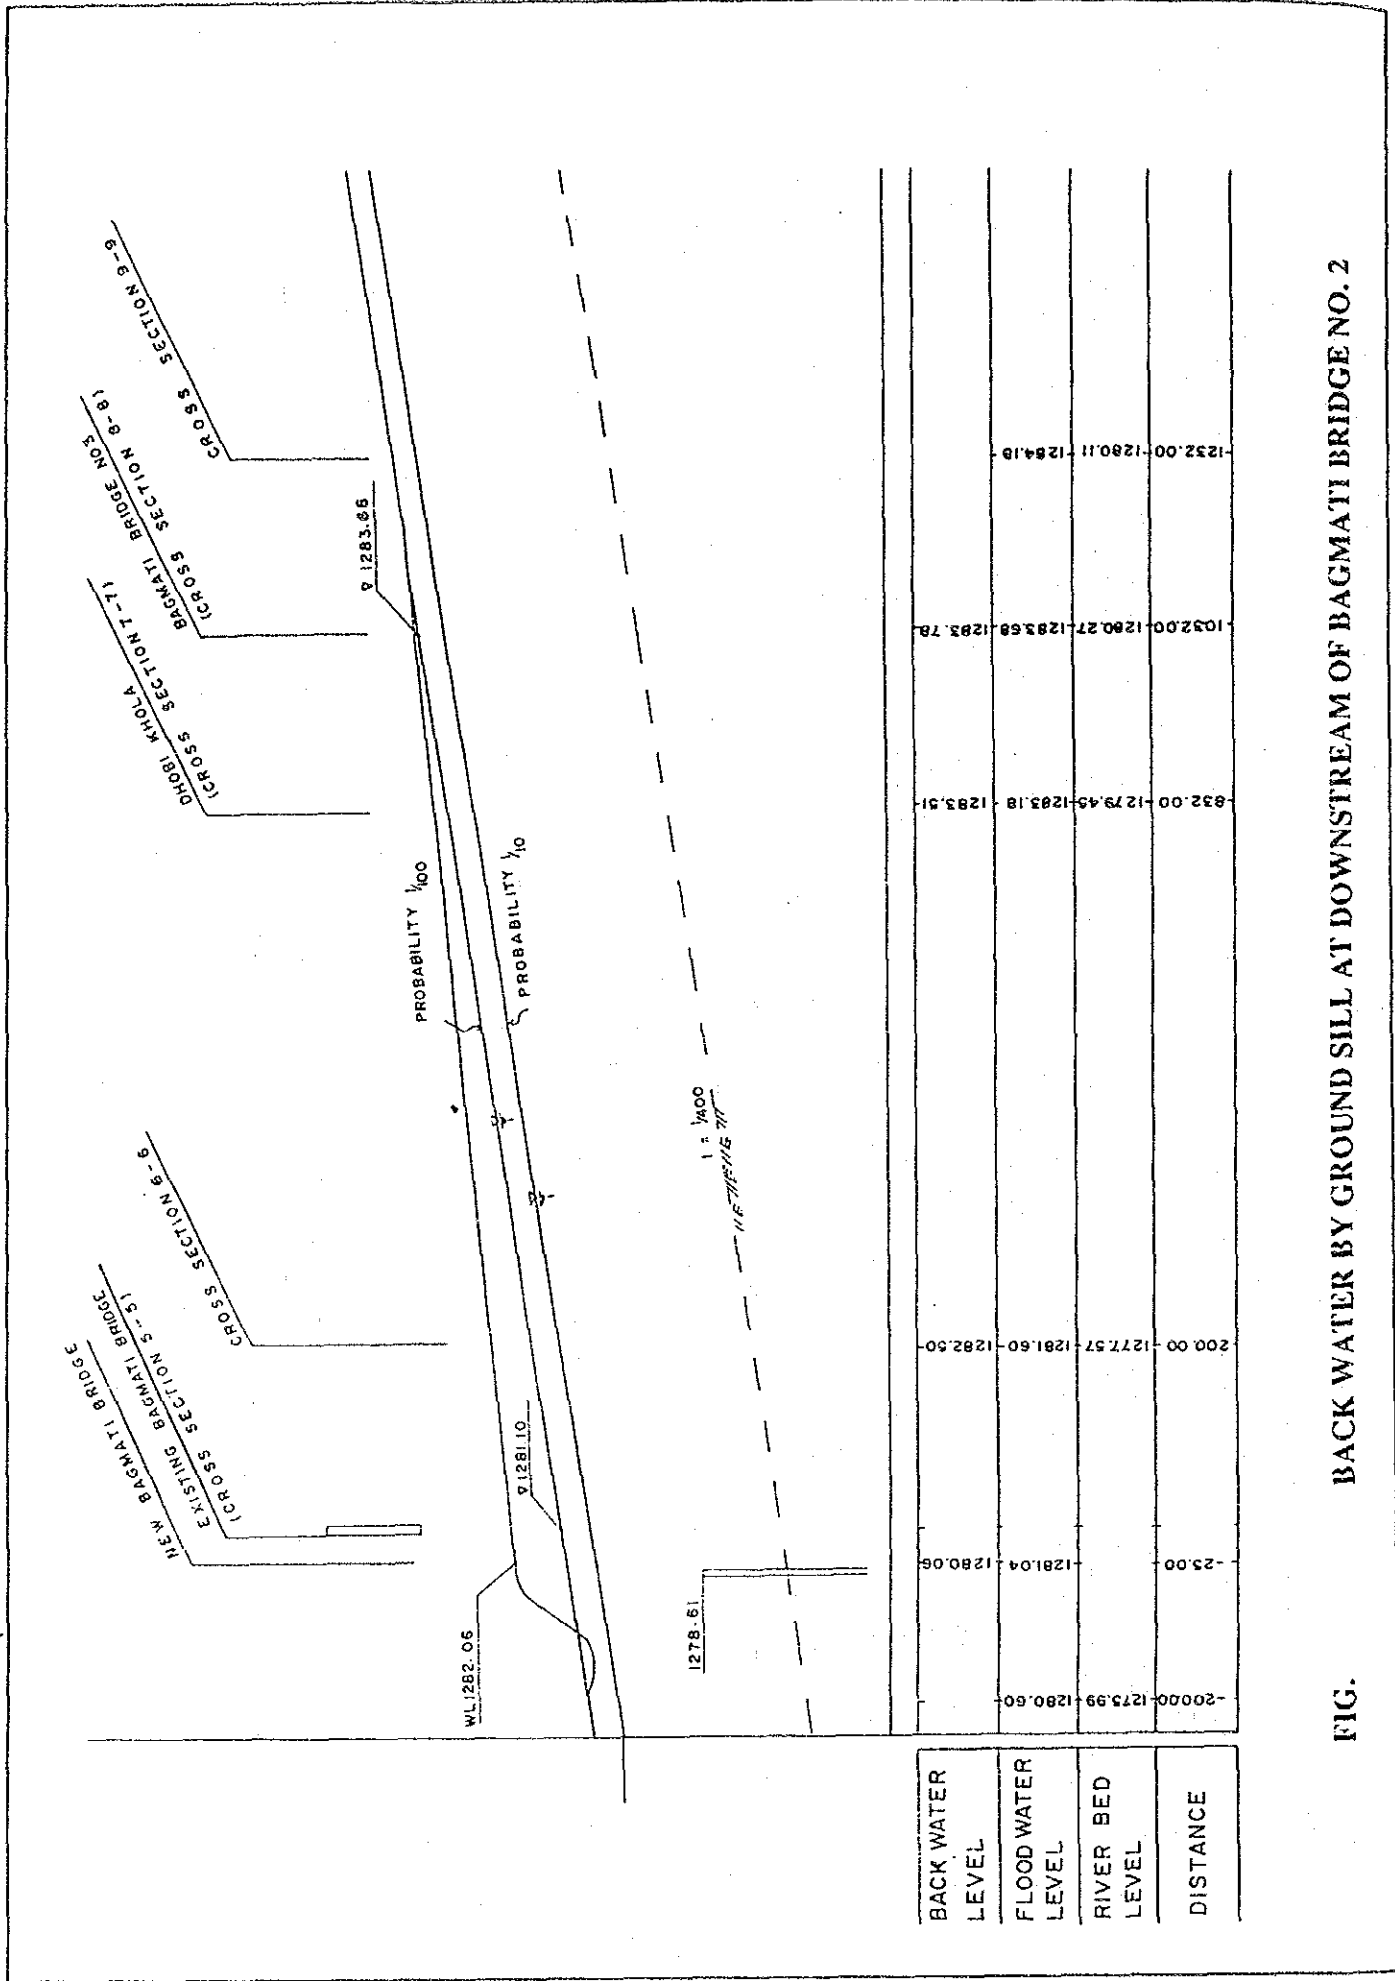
FIG. BACK WATER BY GROUND SILL AT DOWNSTREAM OF BAGMATI BRIDGE NO. 2
